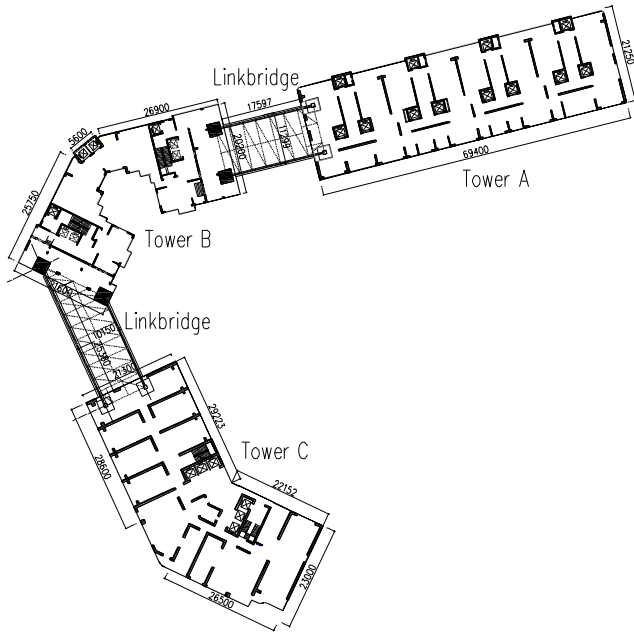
Linkbridge floor plane of Shenzhen Shirble the Prime.
